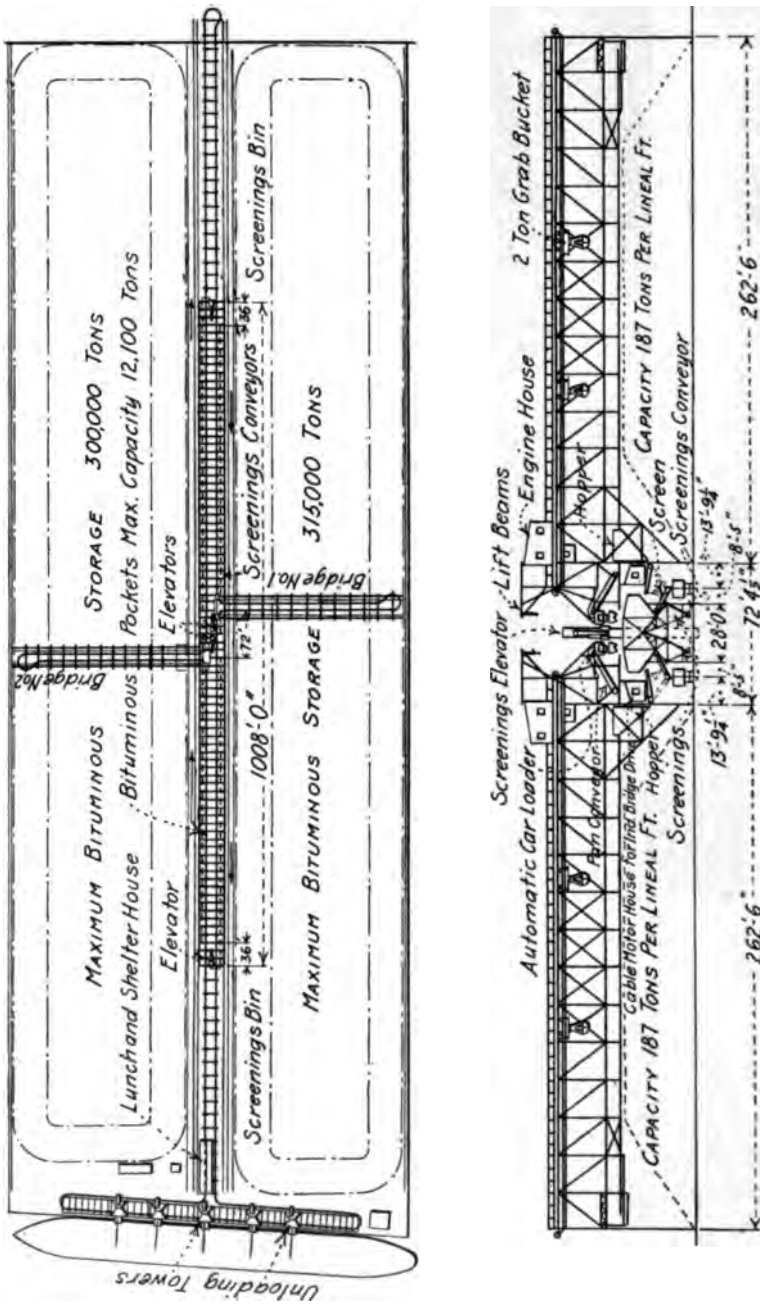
MEAD HOISTS, AUTOMATIC CARS, CABLE RAILWAY SYSTEM AND STOKING AND RECLAIMING BRIDGES, DULUTH, MISSISSAUGA, AND NORTHERN RAILWAY COMPANY'S DOCK, DULUTH, MINN.
